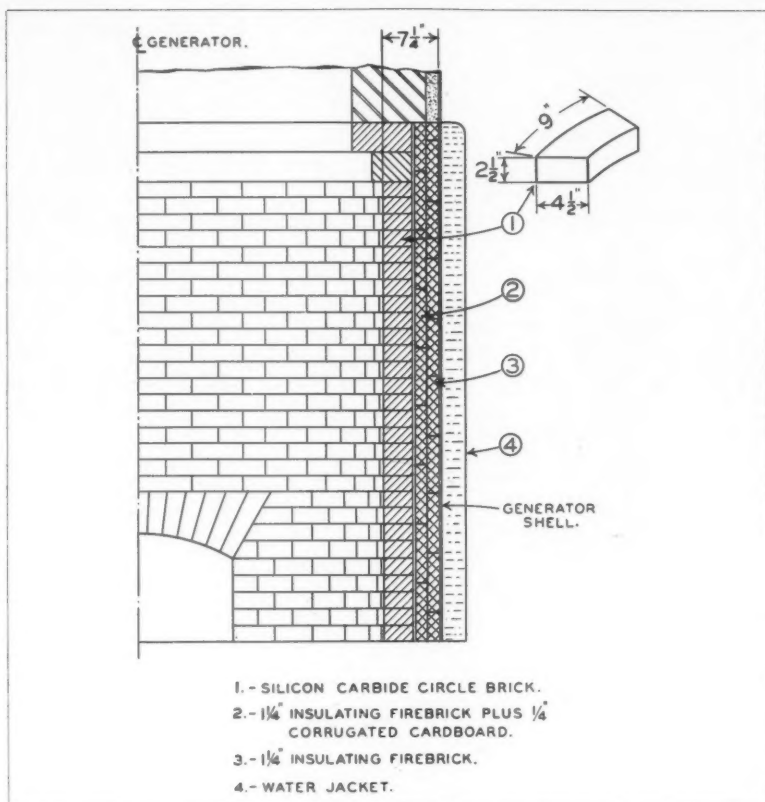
Figure III. Standard silicon carbide brick used with insulating firebrick splits and water jacket in thin wall of water gas generator
